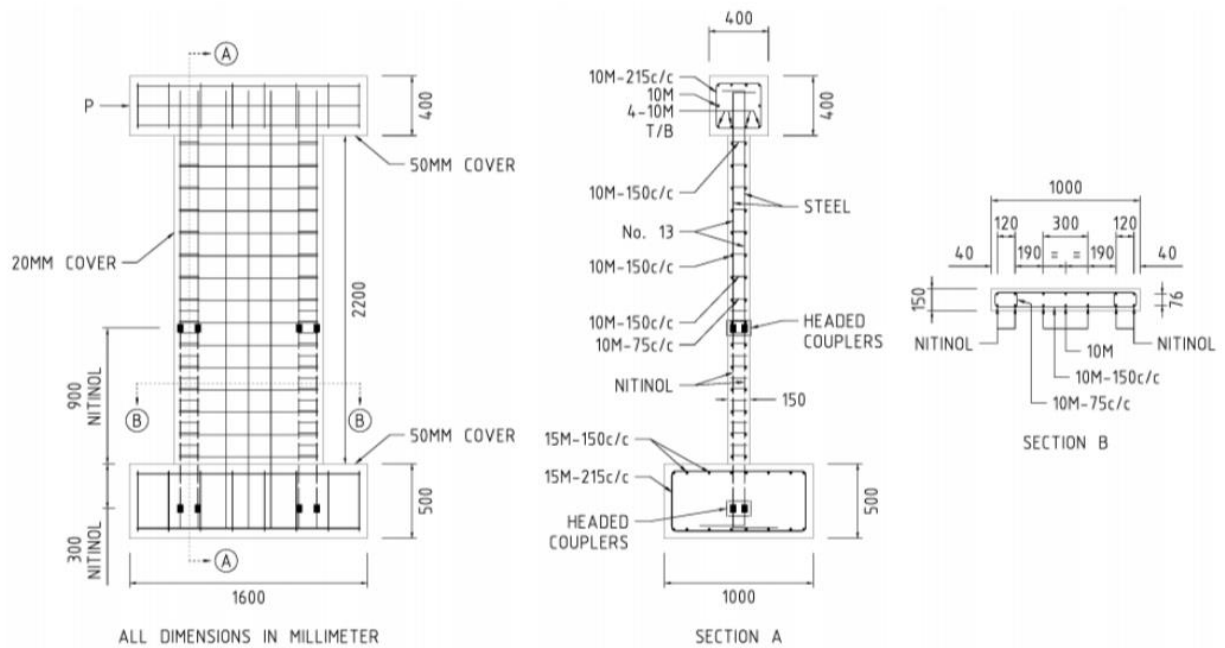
Wall dimensions and reinforcement layout of SMA shear wall (Morcos & Palermo, 2018).
